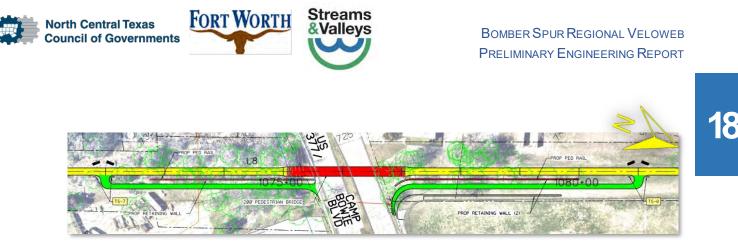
US 377/Camp Bowie Blvd Bridge Overpass and Connection
